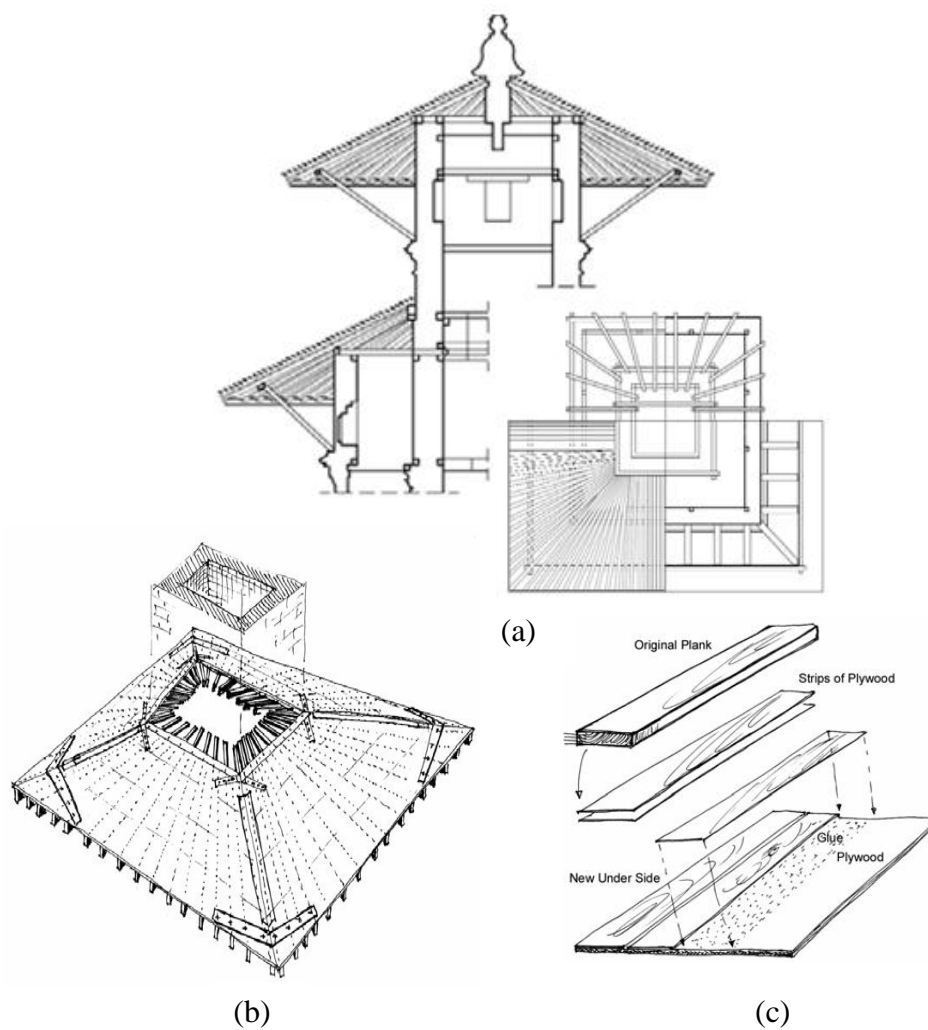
Typical roof detailing: (a) timber pitches in a radial configuration, (b) roof connection using wood connectors at corners, and (c) plywood (Bonapace et al. 2003; Nienhuys 2003).
